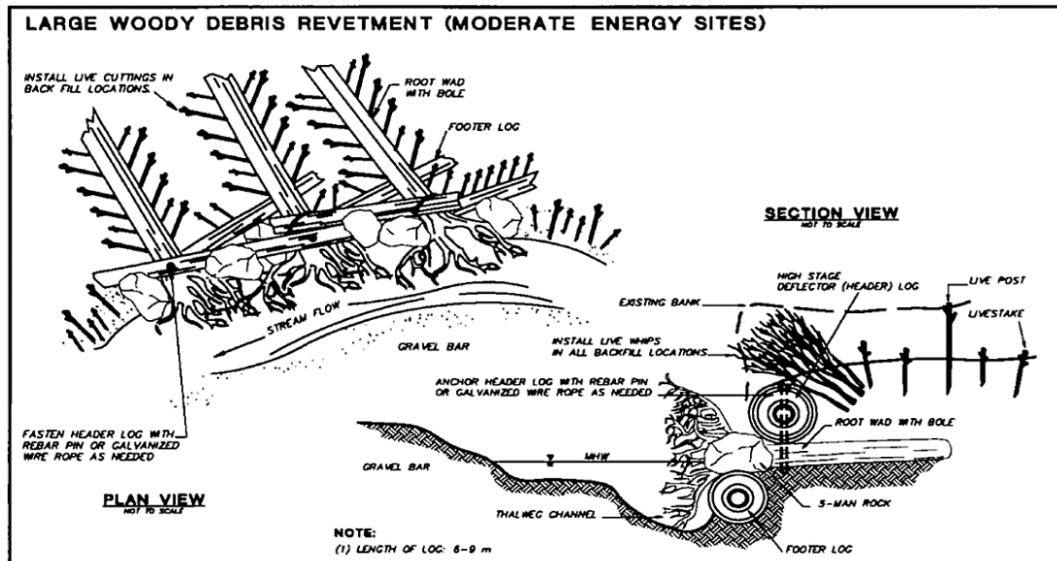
Conceptual design of tree revetments in moderate energy site (Slaney and Zaldokas 1997). Revetments will be installed upstream and downstream of the reconstructed outside bend.
